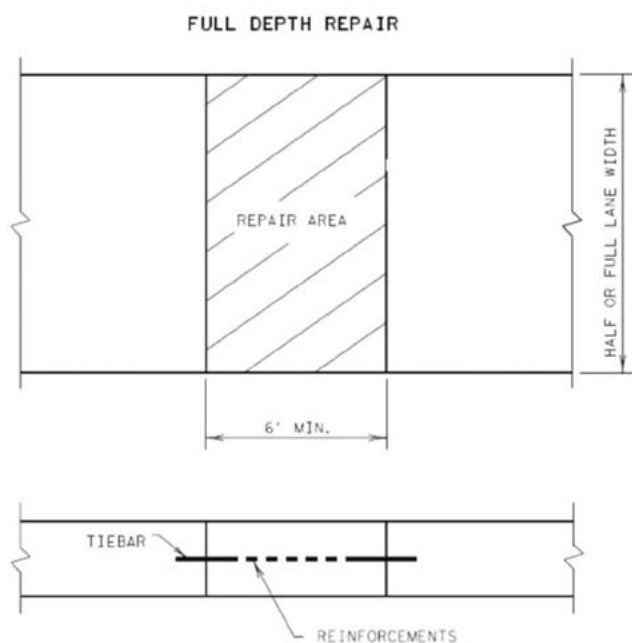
New steel in FDR spliced to longitudinal steel exposed in CRCP.
